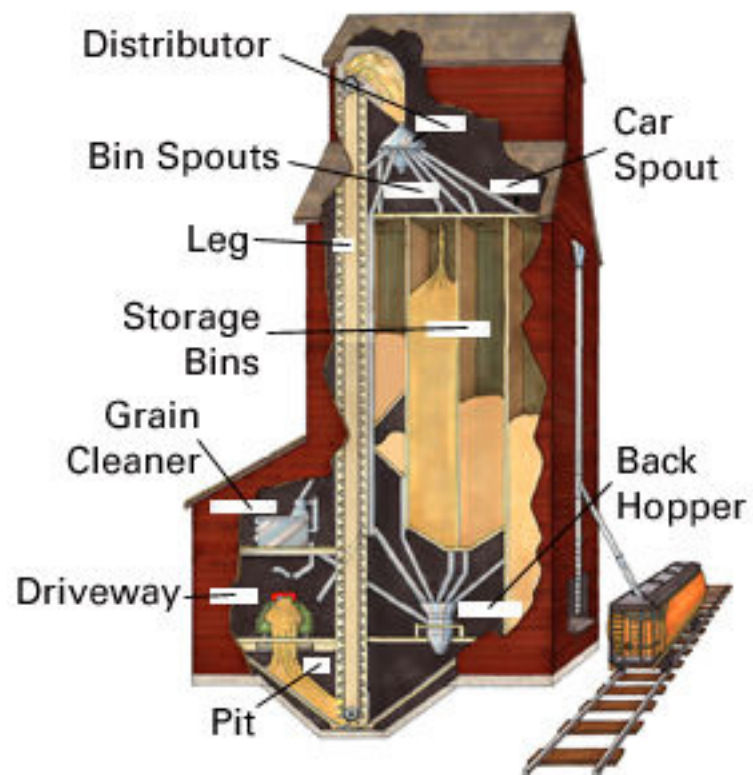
Diagram of the interior workings of a wooden grain elevator (Nohr 2021, 9)
